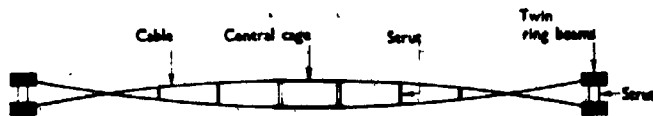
Cross-section of Intermediate Type Lens-shaped Roof
